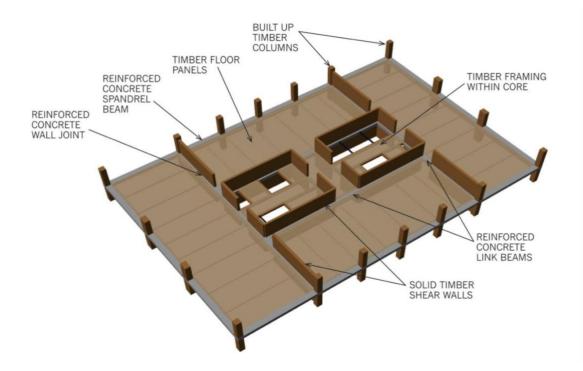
Typical floor diagram of the timber-concrete jointed-frame system by Baker et al. (2014).
